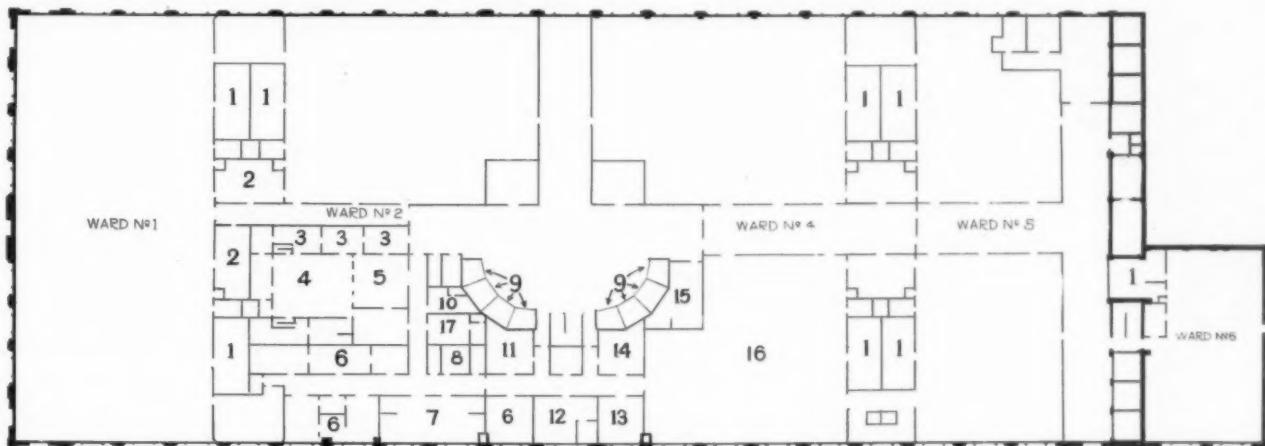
Plan of third floor, which is typical of remaining ward floors.
